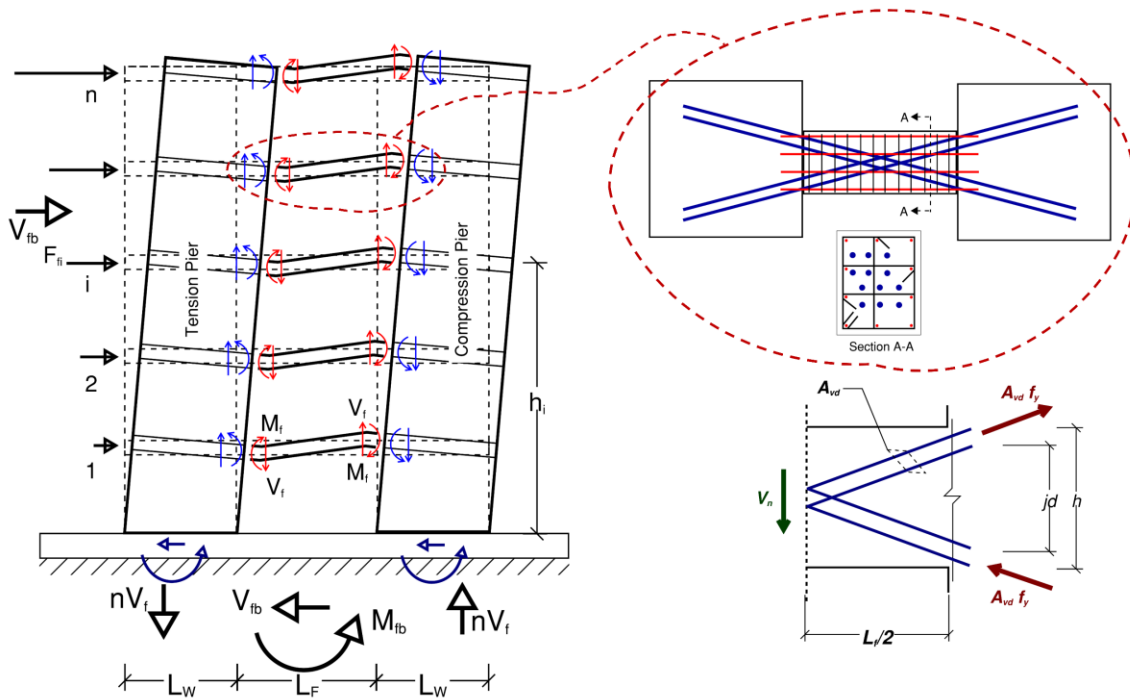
deformation of RC coupled wall: plastic hinge formation, framing actions, lateral force variations, and diagonally reinforced coupling beam resisting reactions.
